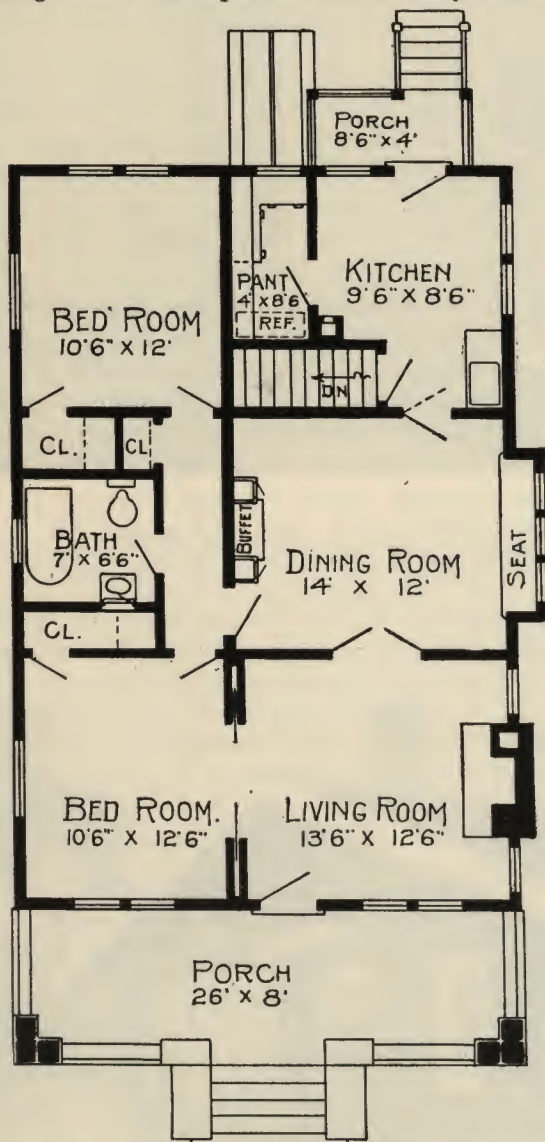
A study in plan reading. (Main floor plan design No. 6632.)
